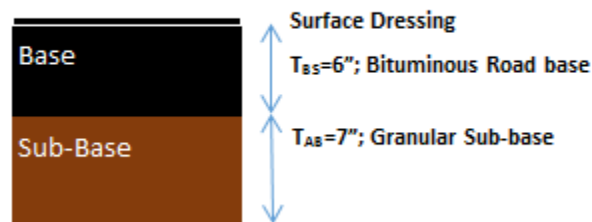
Proposed road section for CSAH 14 using Rolt's method
